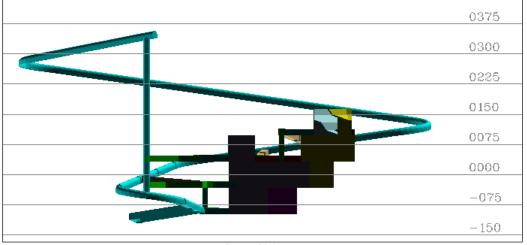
Completed Mine Design – Mustang (Looking North)
